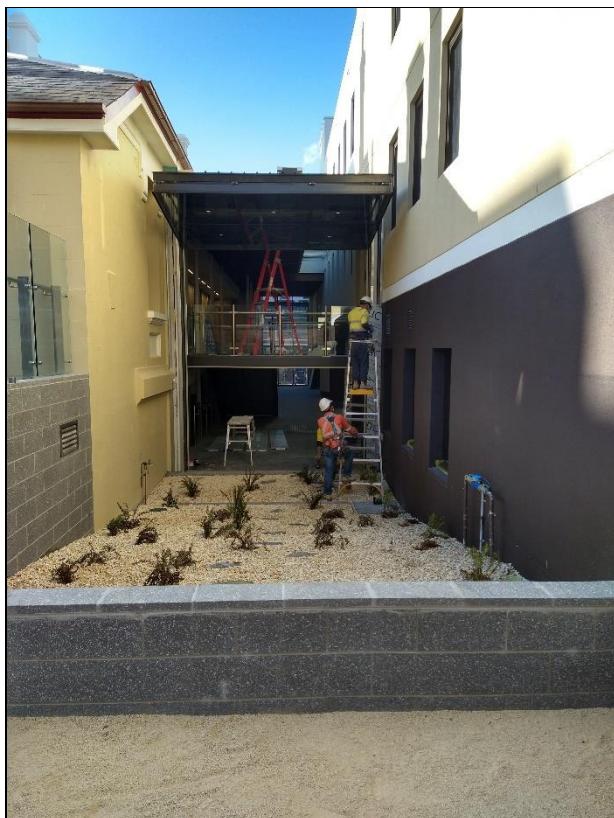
Looking north at garden bed and walkway along southern side of Atrium (20 August 2021)
